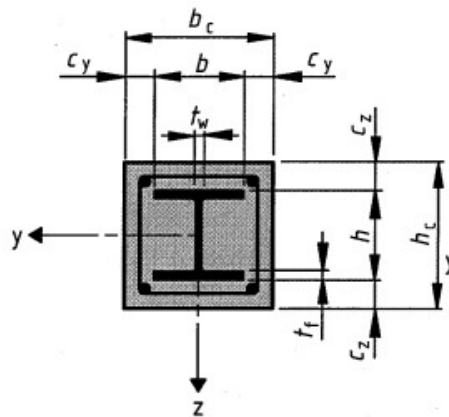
Typical cross-sections of concrete encased composite columns and notation (EN 1994-1-1:2004)
